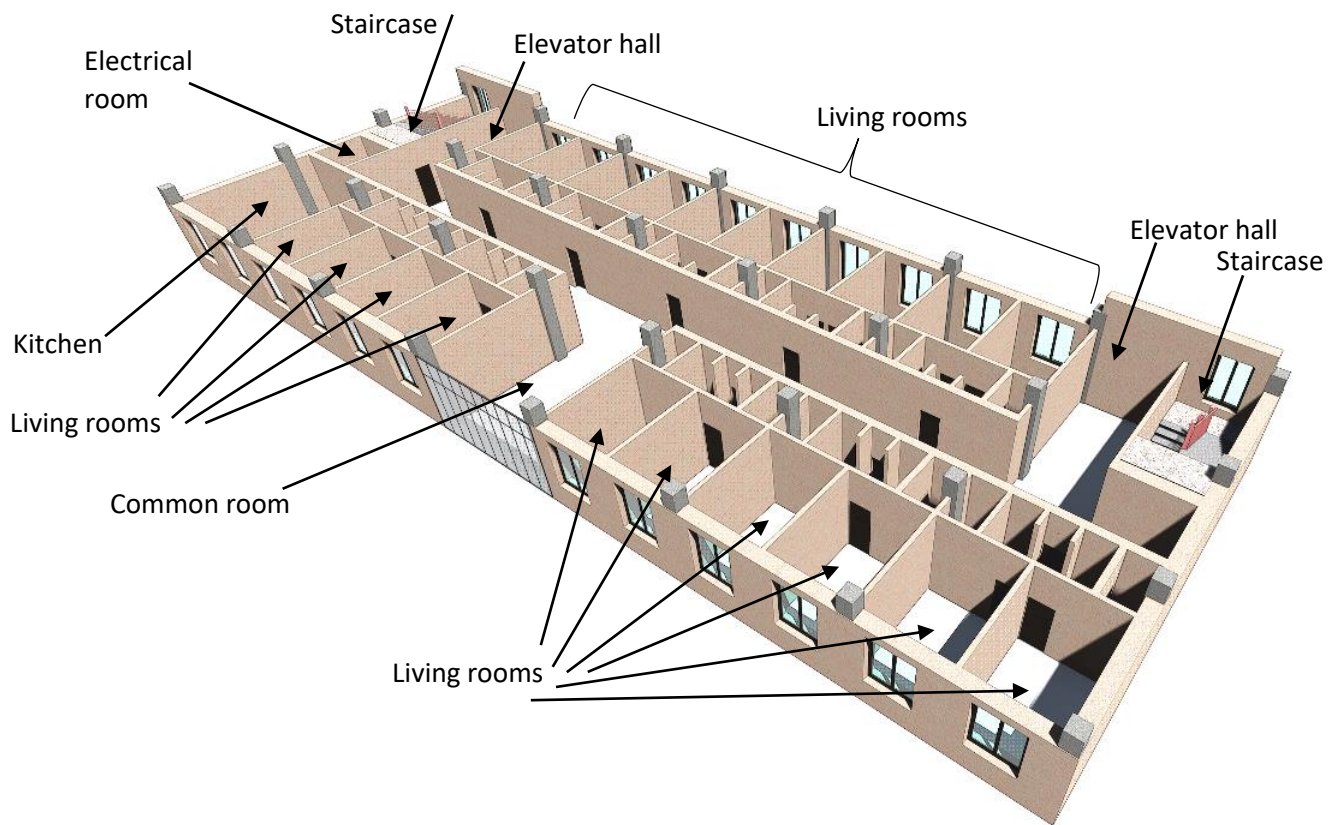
Rendered typical floor plan (AutoCAD – Lumion 6)
